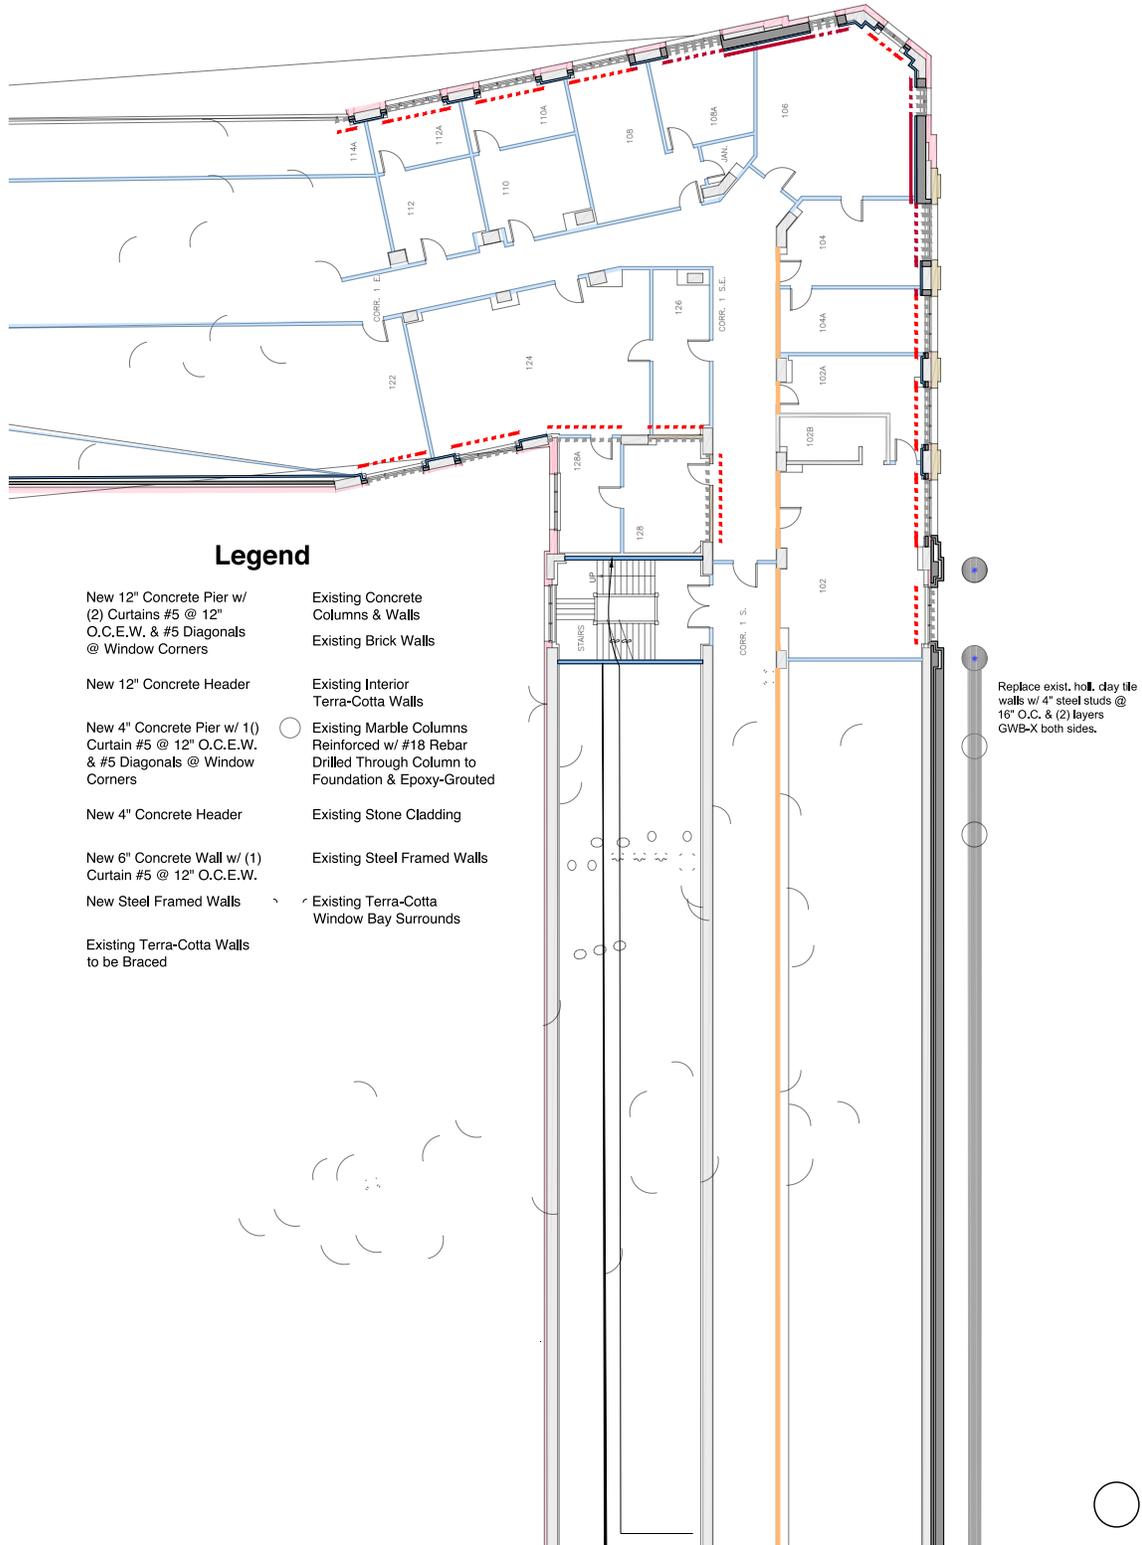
(3): Recom. HCT Wall Bracing/Replacement Locations-Floor Level 1
